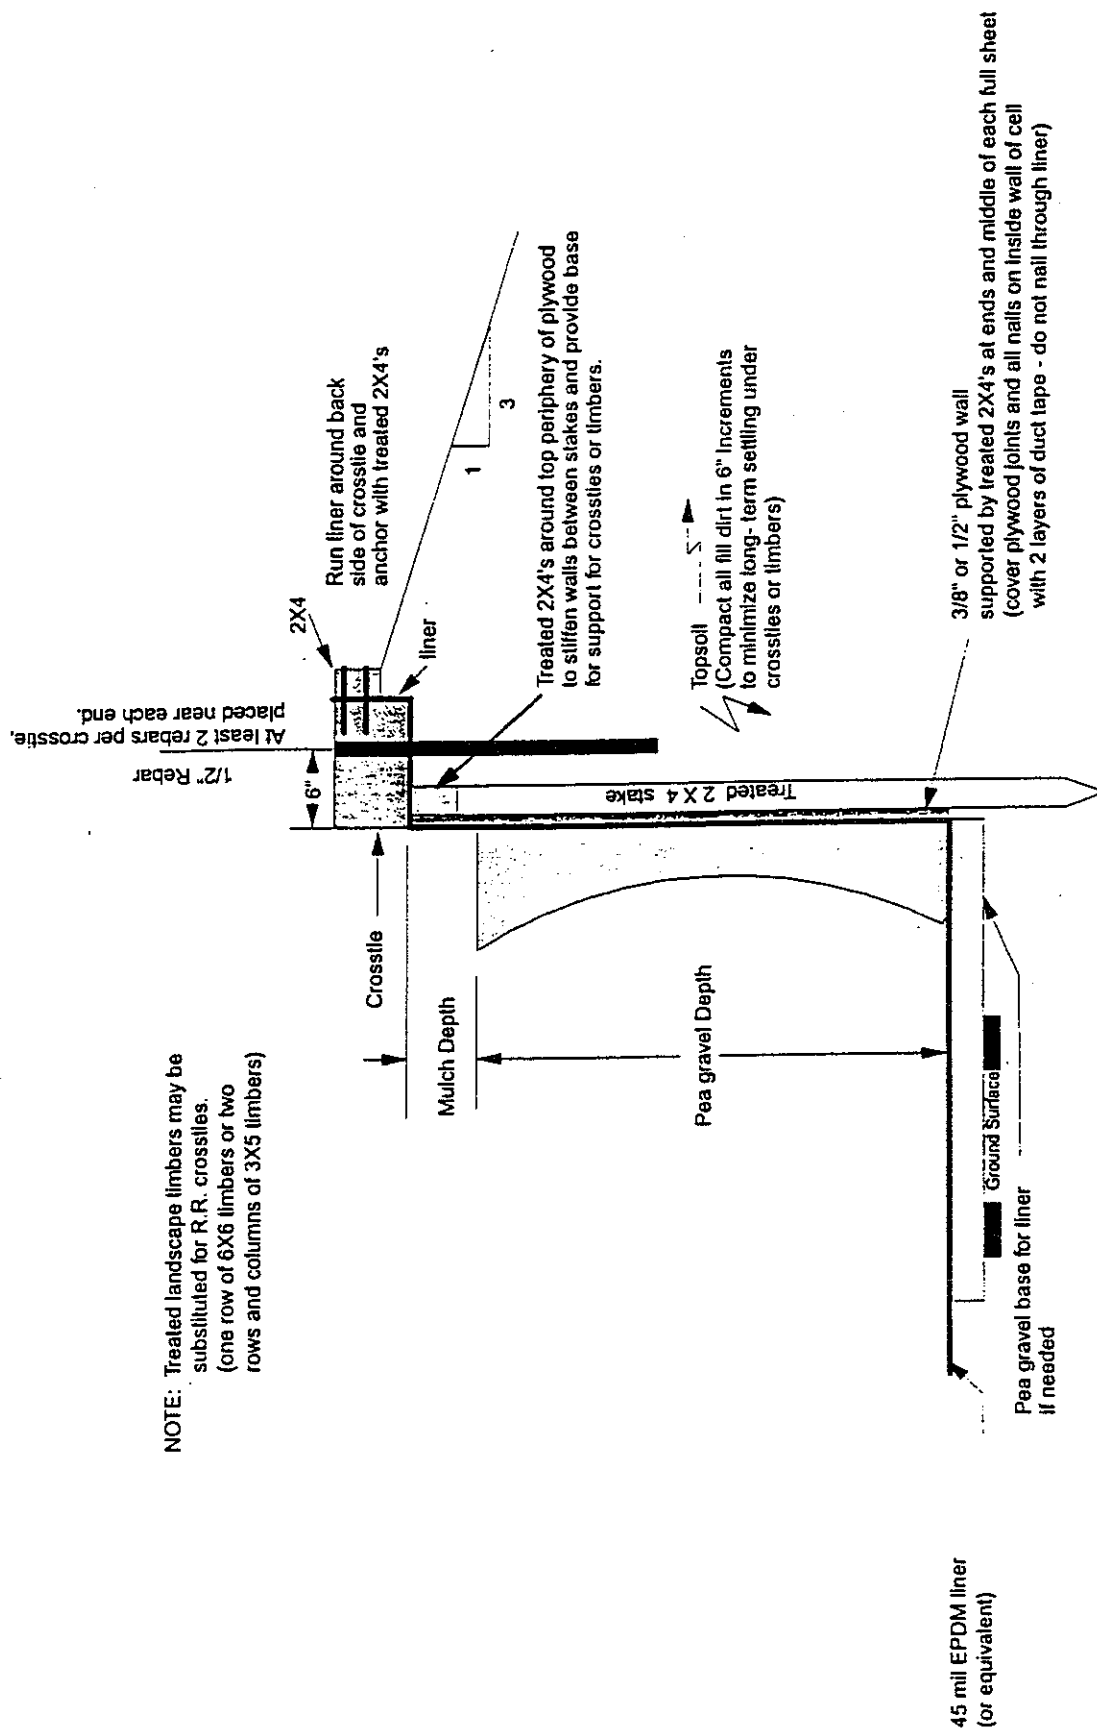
Method for vertical wall construction (Steiner and Watson, 1993).
